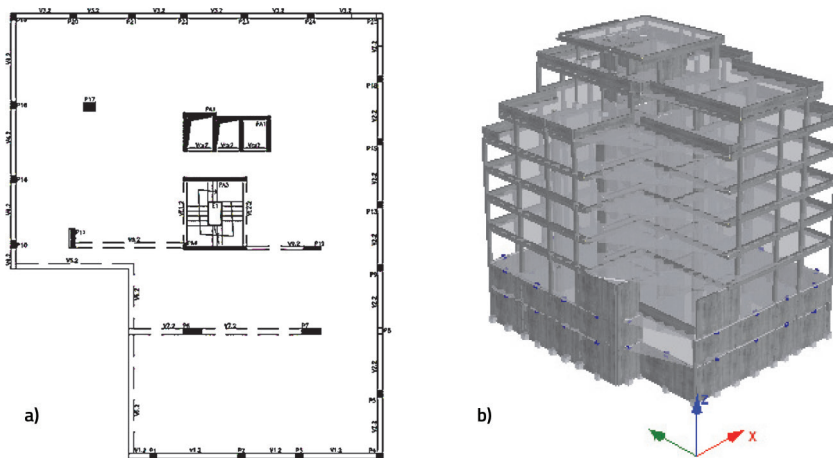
a) Typical floor plan; b) Seismostruct 3D model of the structure
